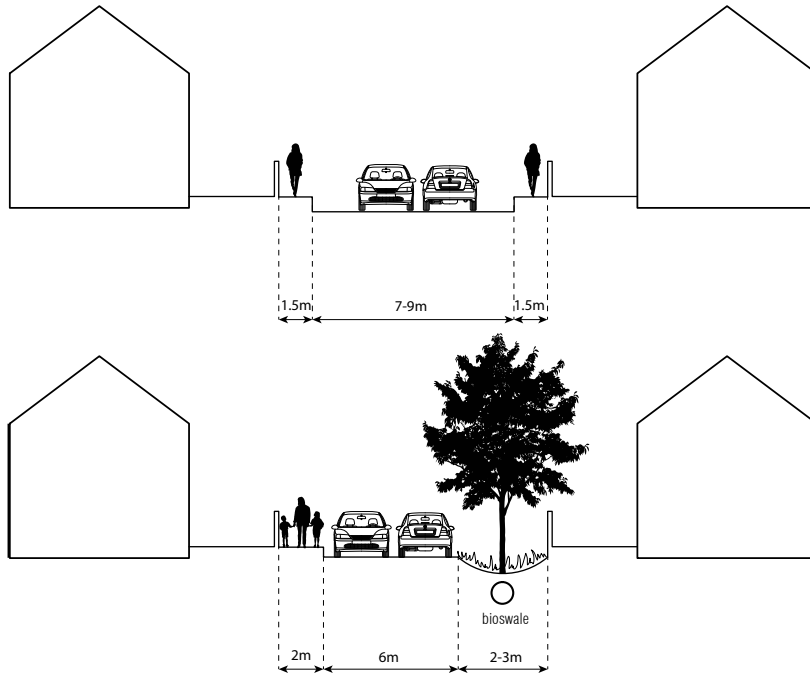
1. Existing neighbourhood street profile, 2. Proposed neighbourhood street profile
